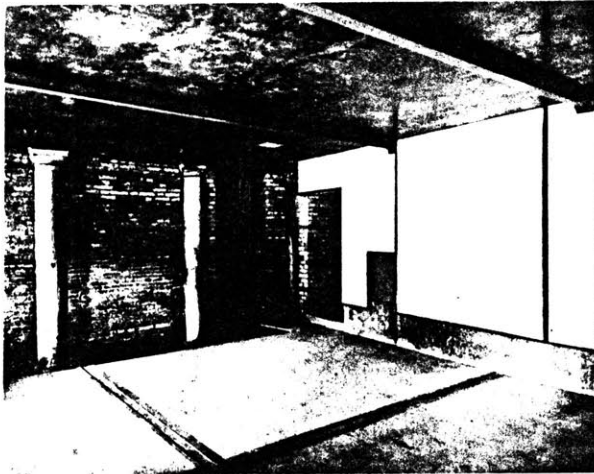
Left end meeting room. Notice the new floor slab pulled away from the original engaged columns and the patterning in the floor.
